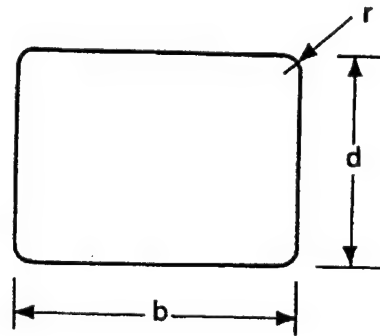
Specimen Cross Section for a Rounded-Edge Beam.
